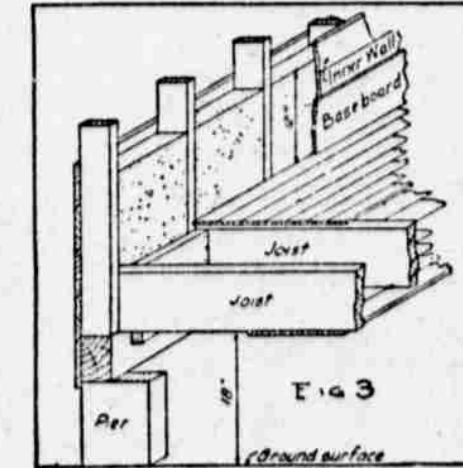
Buildings Supported on Piers Are Ratproofed by Raising Above Ground Level and Placing Concrete Between Walls Above Sills.
